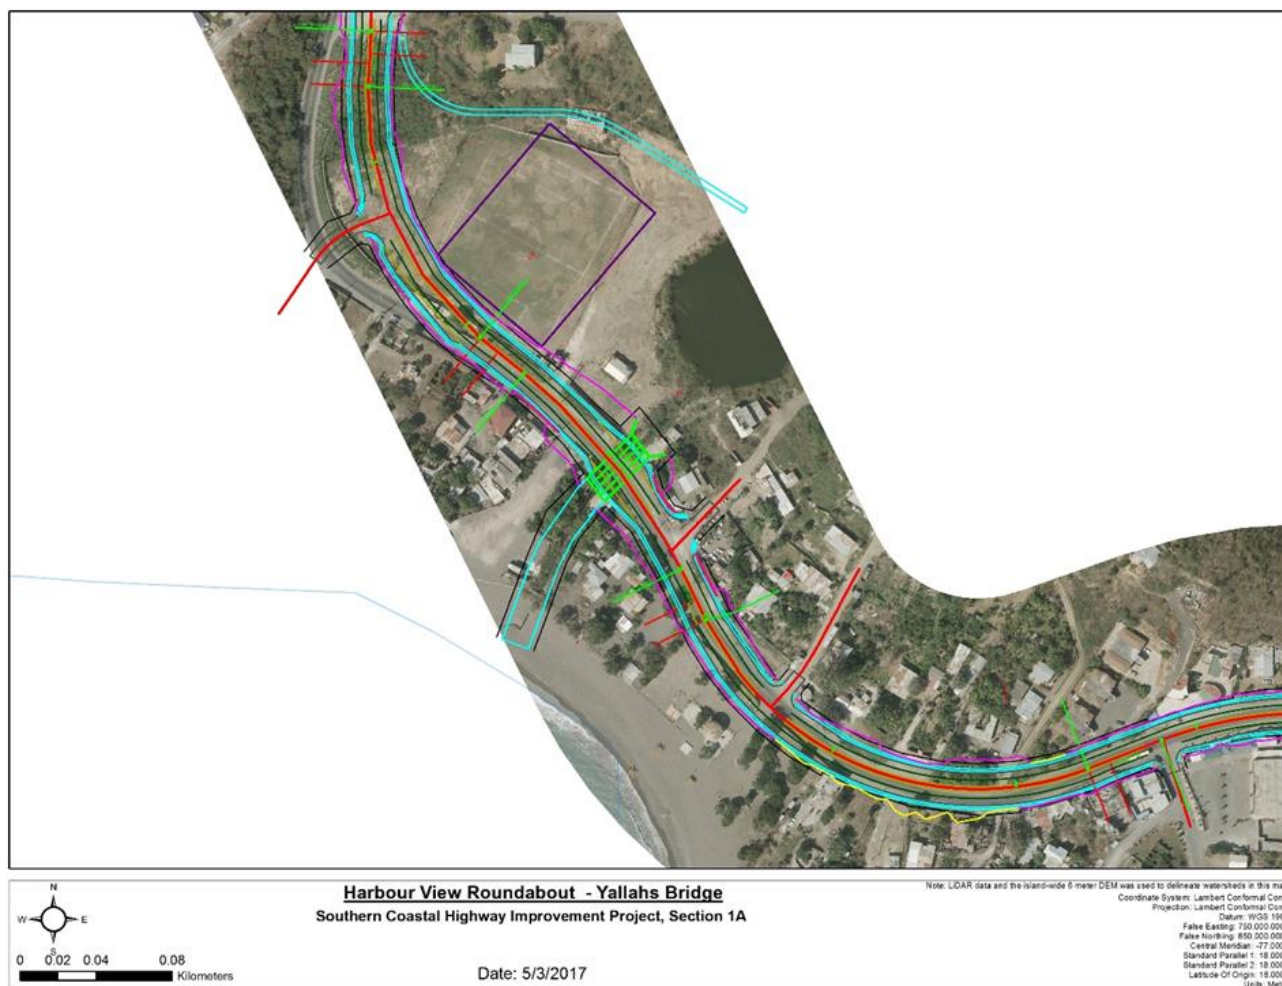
Roadway plan showing drainage design to mitigate flooding at 103+500 to 103+700
